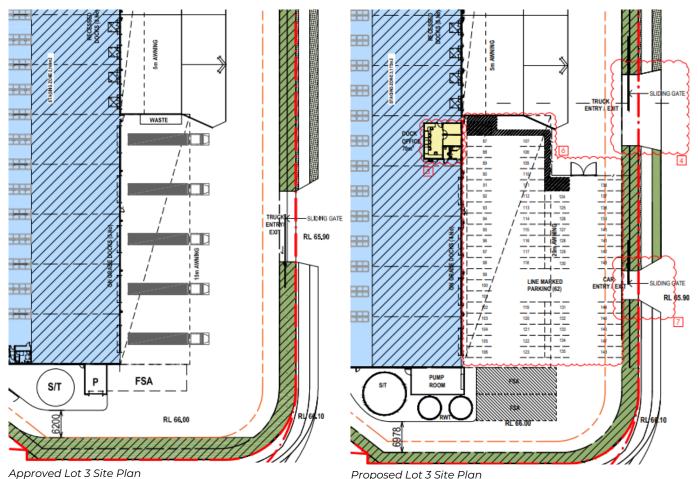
Comparison of Approved and Proposed Warehouse 3 Site Plan – Car Parking and Hardstand Source: Nettletontribe Architects
